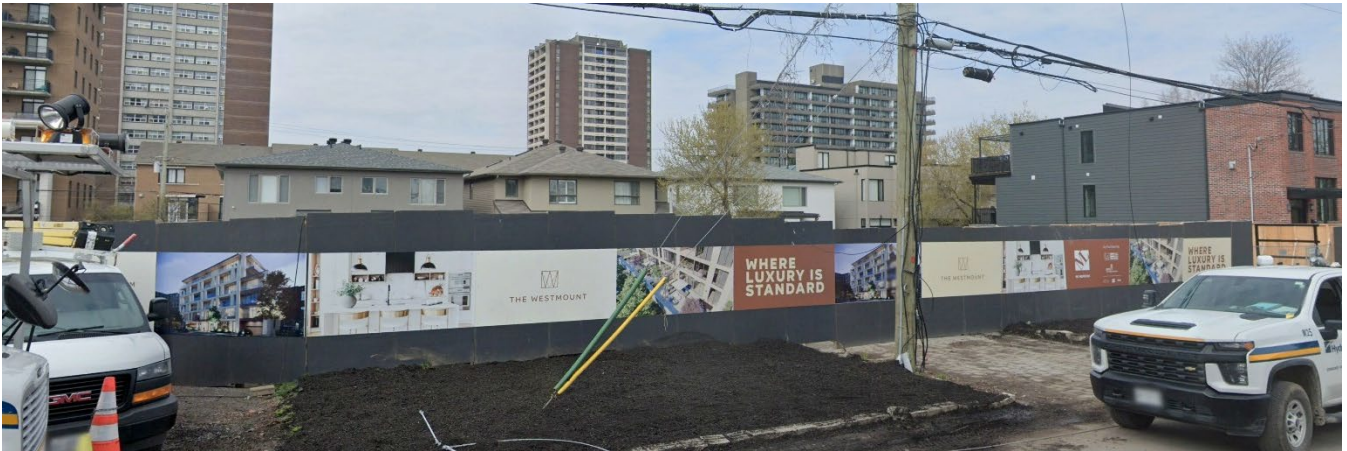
Streetview of subject property, looking west on Roosevelt Avenue.
